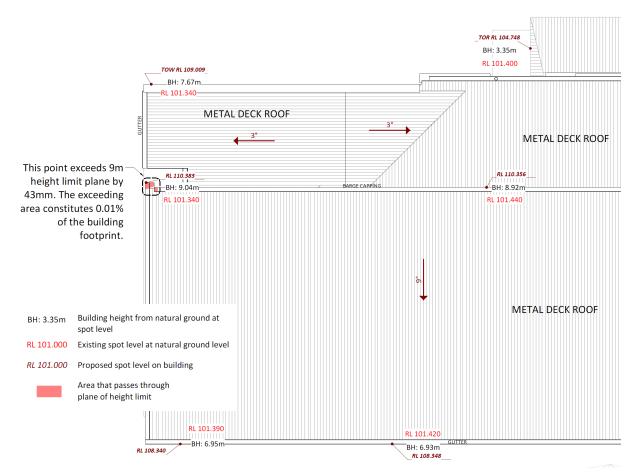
Extract of Roof Plan of Stage 3 / 4 Building showing the location of the exceedance of the building height development standard (Alleanza Architecture)
